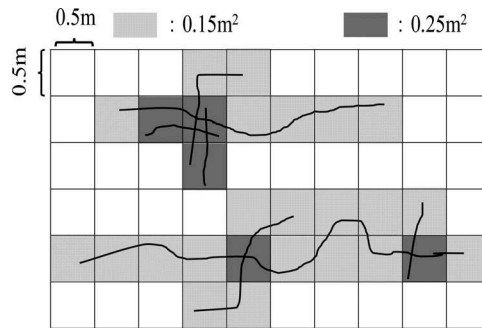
Method for calculating the crack ratio of asphalt pavement.
